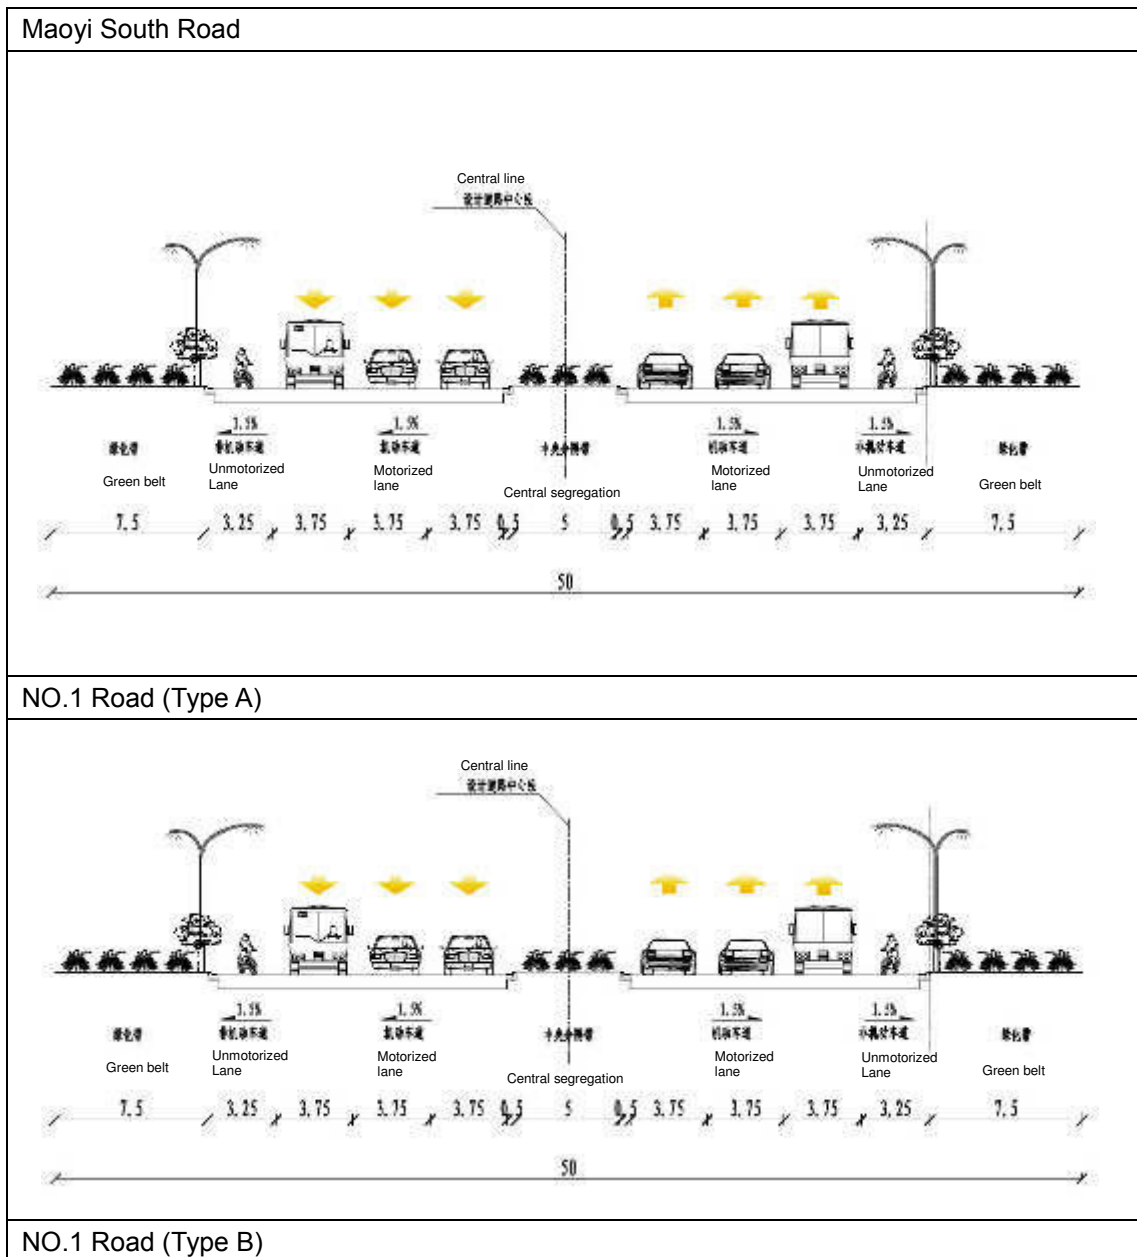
Cross-sections of proposed China-Russia Business Park roads (SY)
